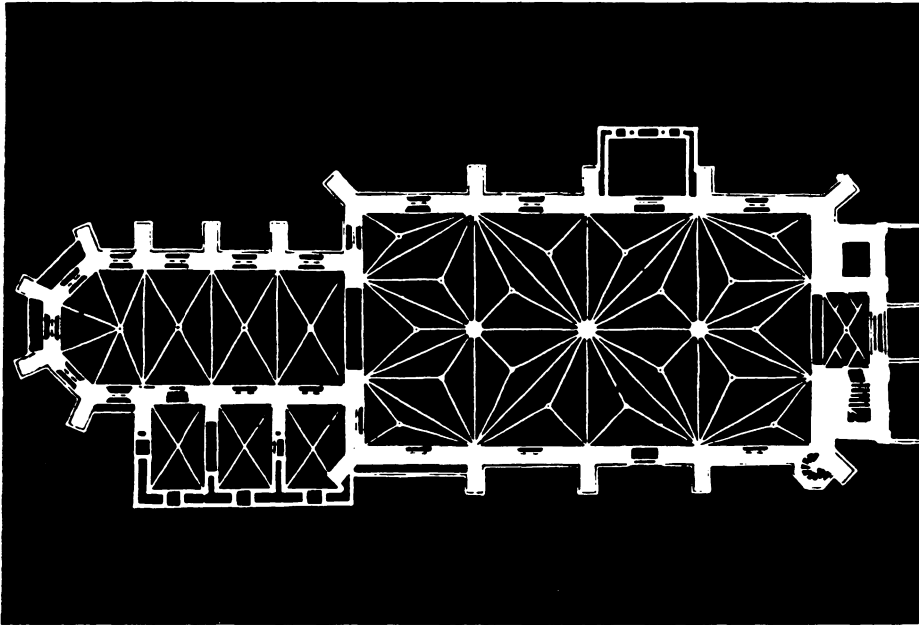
Wiślica, Poland: Collegiate church - plan.
